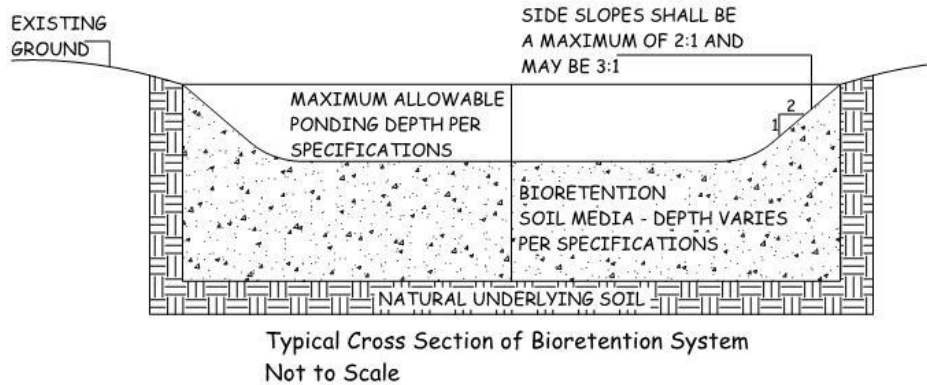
Typical Bioretention System (Trinkaus Engineering, LLC – 2017)
